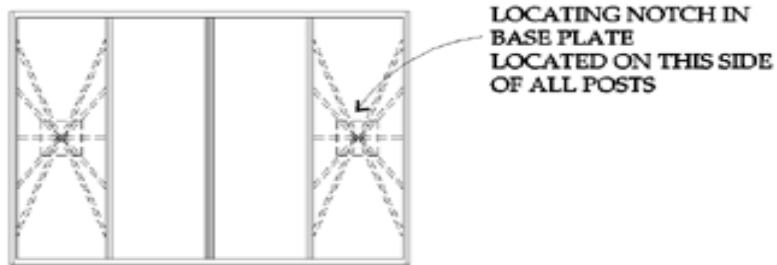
Kaleidoscope Centered Canopy Plan View.
